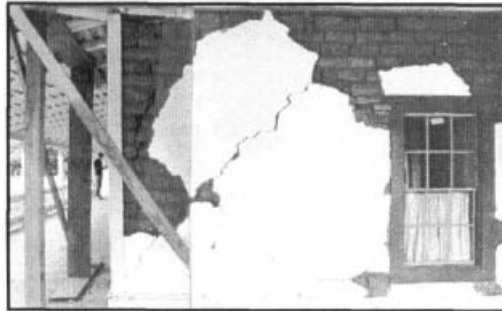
Diagonal crack on the east side of the southeast corner of the second floor. The width of the crack is approximately 1/2 inch. This type of crack can develop at corners, creating a wedge of material that will slide towards the corner
